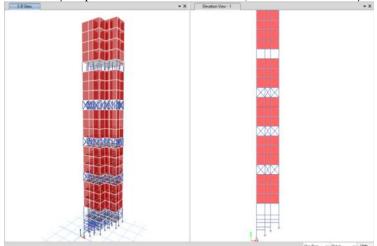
Elevation & 3D view of the building with bracing at 4th+8th+12th floors on 25° sloping ground
